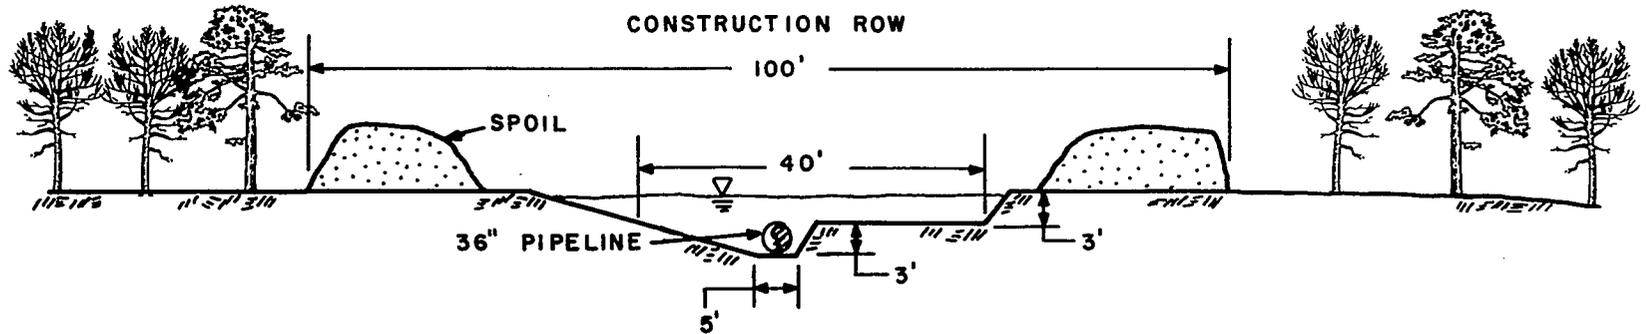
Typical Cross-Section of Conventional Flotation Canal Construction After Excavation and Several Years After Pipeline Installation.
